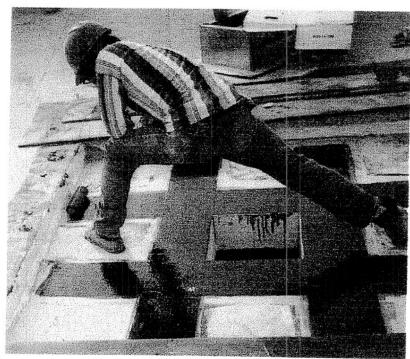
F APPLYING COMPOSITE MATERIAL TO CONCRETE SLAB FOR RETROFIT
